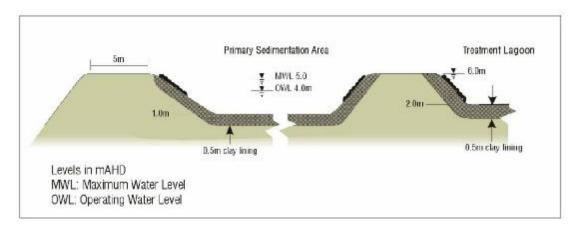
Primary Sedimentation Area and Settlement Pond Typical Cross Sections
